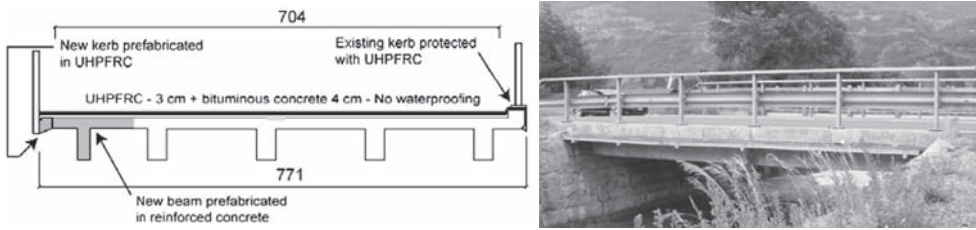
Bridge cross section after rehabilitation (dimensions in cm) and photo taken in 2006.
